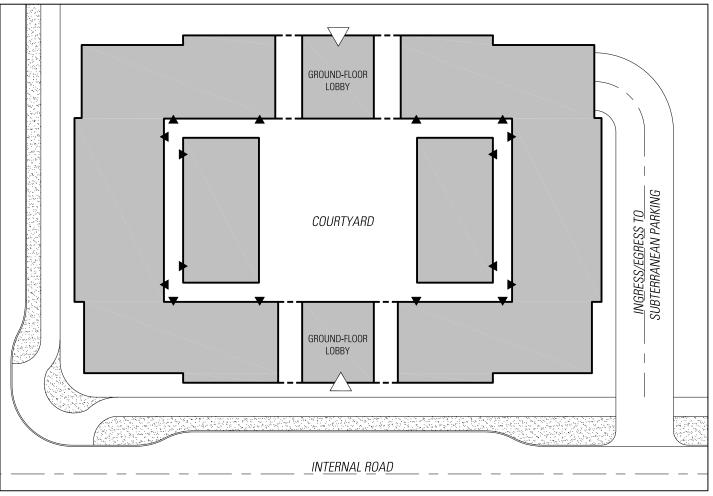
, "Urban Flats Concept Plans and Elevations," illustrates the typical plotting concept for the Urban Flats. Unit sizes may range from approximately 1,150 to 2,100 square feet in size. Exhibit 6-9 illustrates how a 5-story residential building can be modulated and developed with an urban streetscape to provide a pedestrian orientation, varied massing, and a hierarchy of architectural detail.
